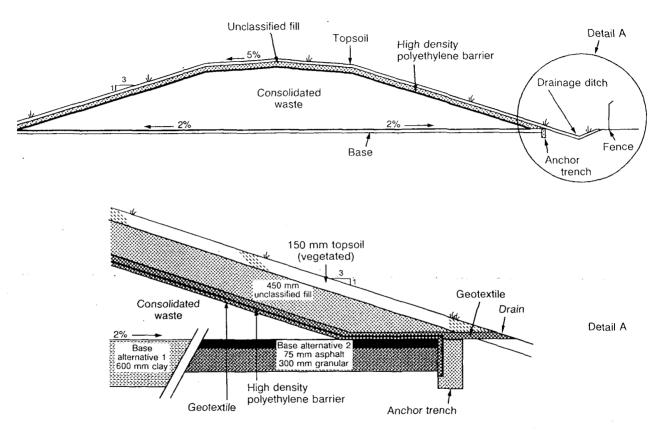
Typical landfill disposal facility (top) and details of construction (bottom).
